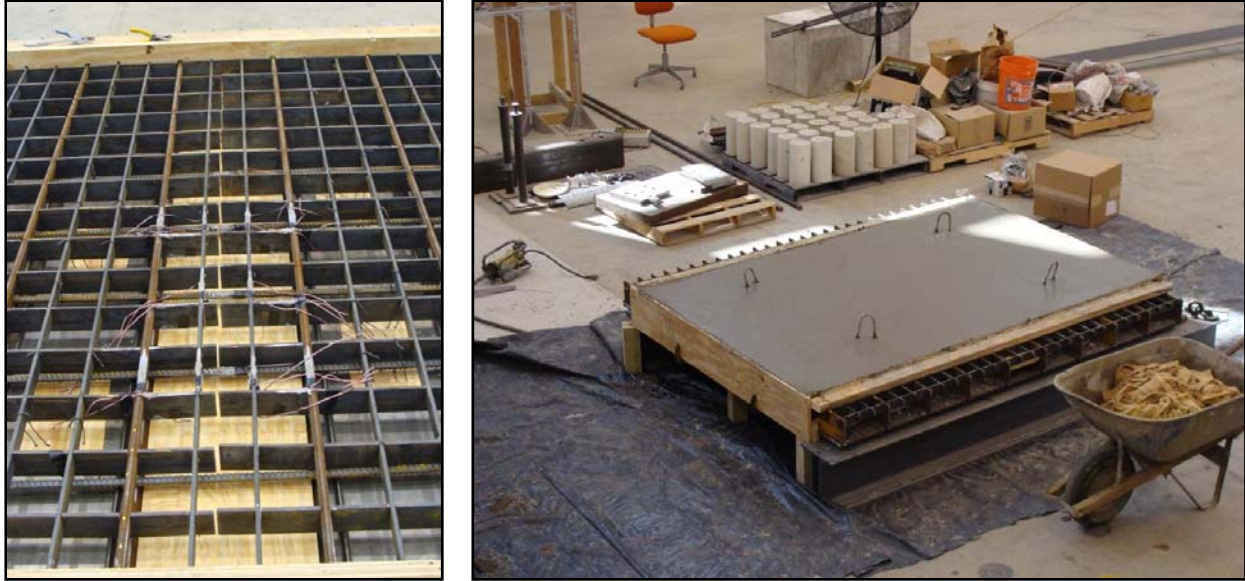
Transverse splice (left) details; (right) specimen after concrete placement
